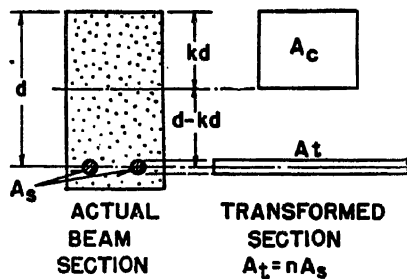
Transformed Section of Reinforced Concrete Beam.
